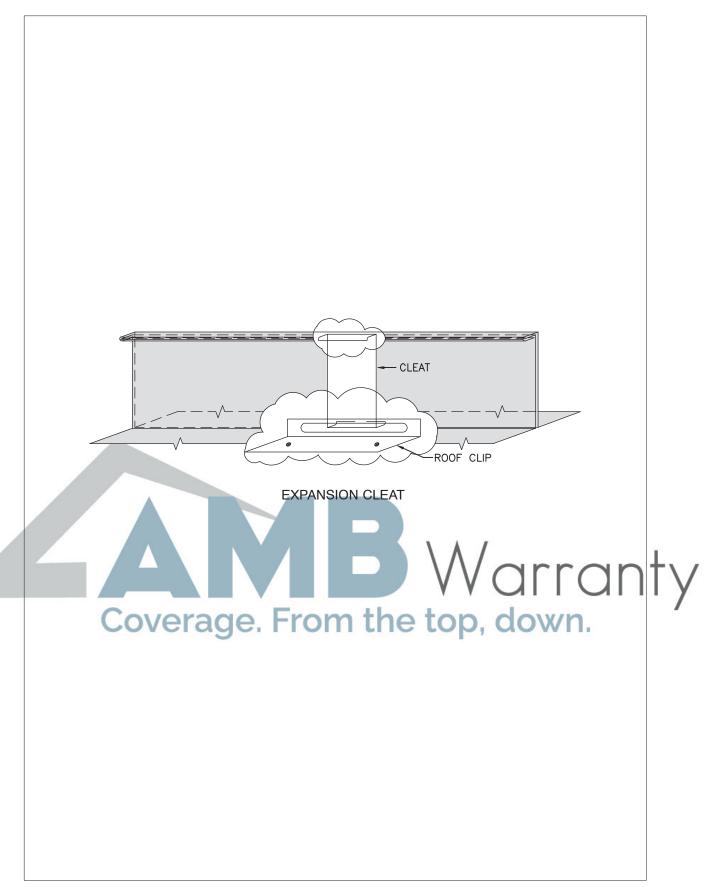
METAL ROOF PANEL EXPANSION AND CONTRACTION
